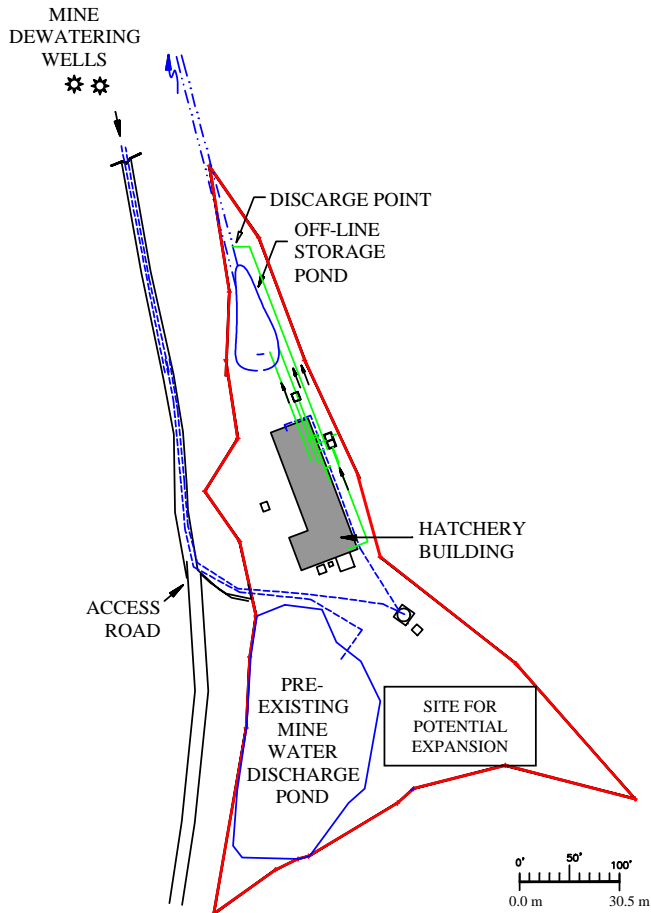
A site plan of the MCRA Hatchery shows the location of the water storage tank and the pipes supplying both the water storage tank (from the mine dewatering pumps) and the hatchery building (Fig. 9).
